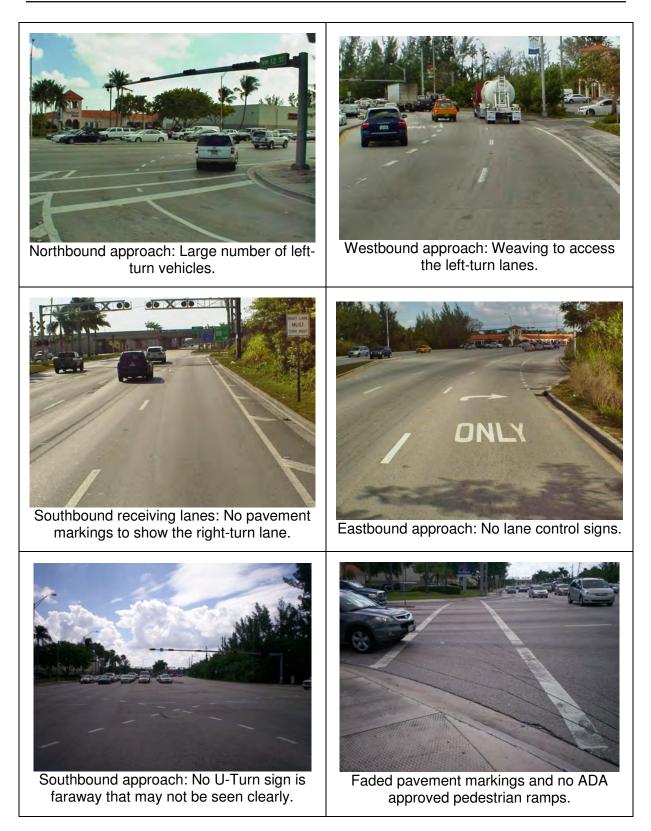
Field Review – NW 107 Avenue and NW 12 Street
